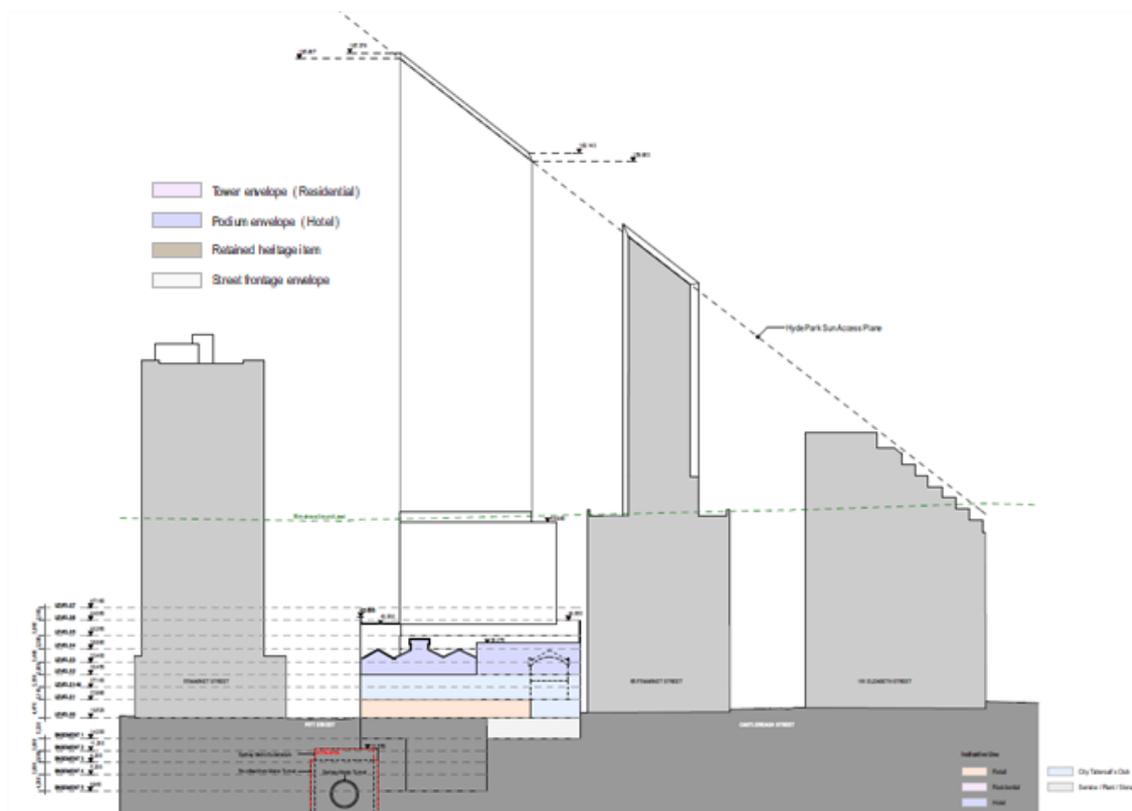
Envelope section west-east through lantern showing sun access plane compliance.
